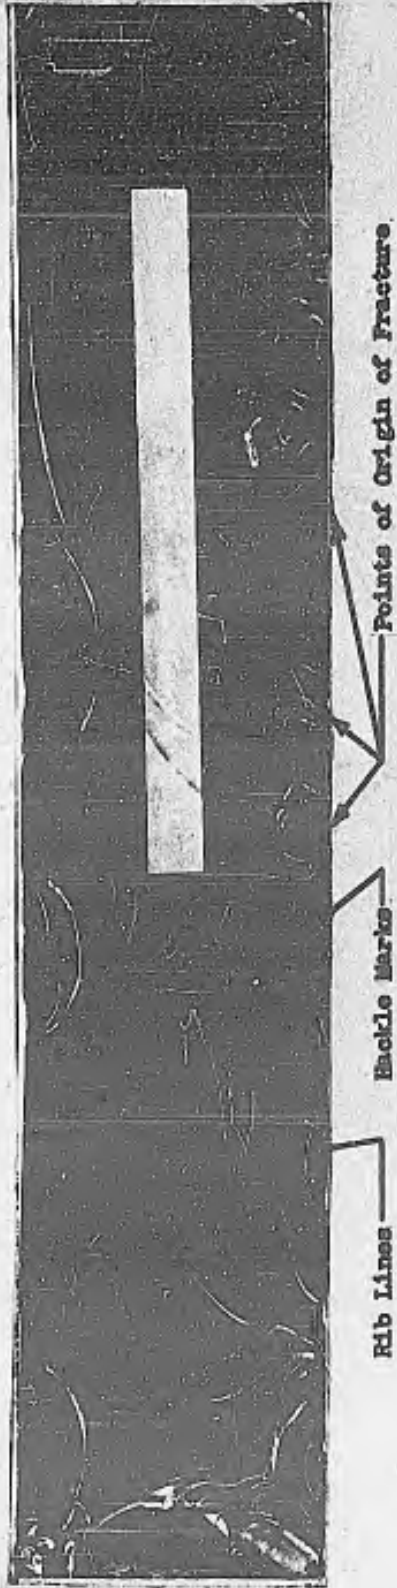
PHOTOGRAM OF FRACTURE SURFACE OF ANNEALED GLASS PANE (SPECIMEN NO. 1, TEST NO. 1)
